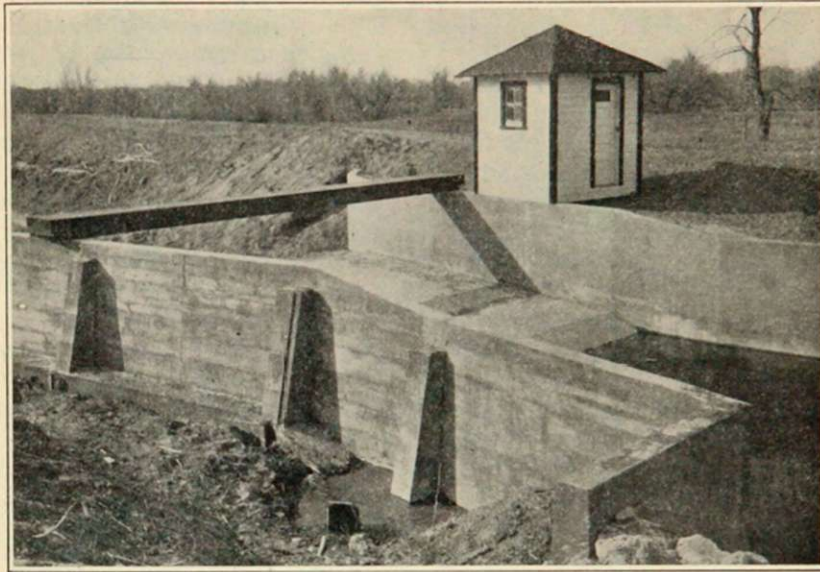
Flume wall, with counterfort bracing, of the 20-foot flume on Bijou Canal.
